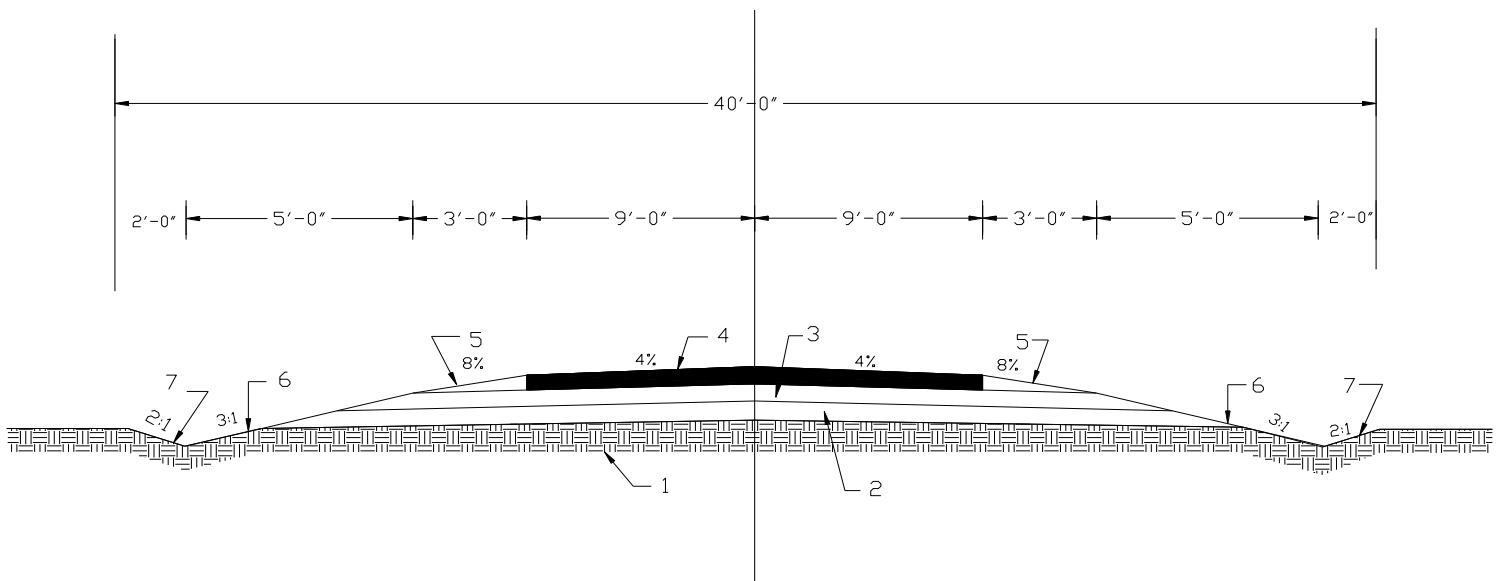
TYPICAL 40 FEET CROSS SECTION OF ROADWAY.
